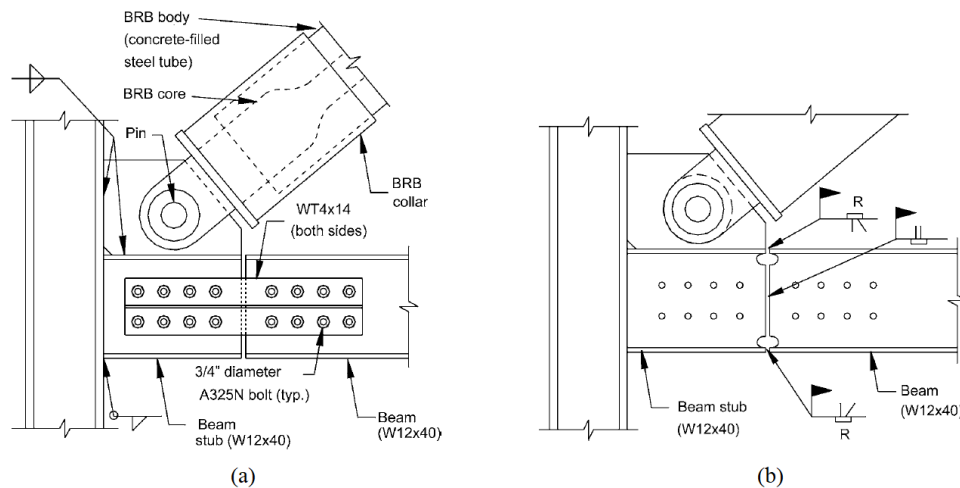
BRB frame connection details: (a) bolted spliced beam, pinned brace; (b) welded spliced beam, pinned brace. (from Fahnestock et al.^[37])
